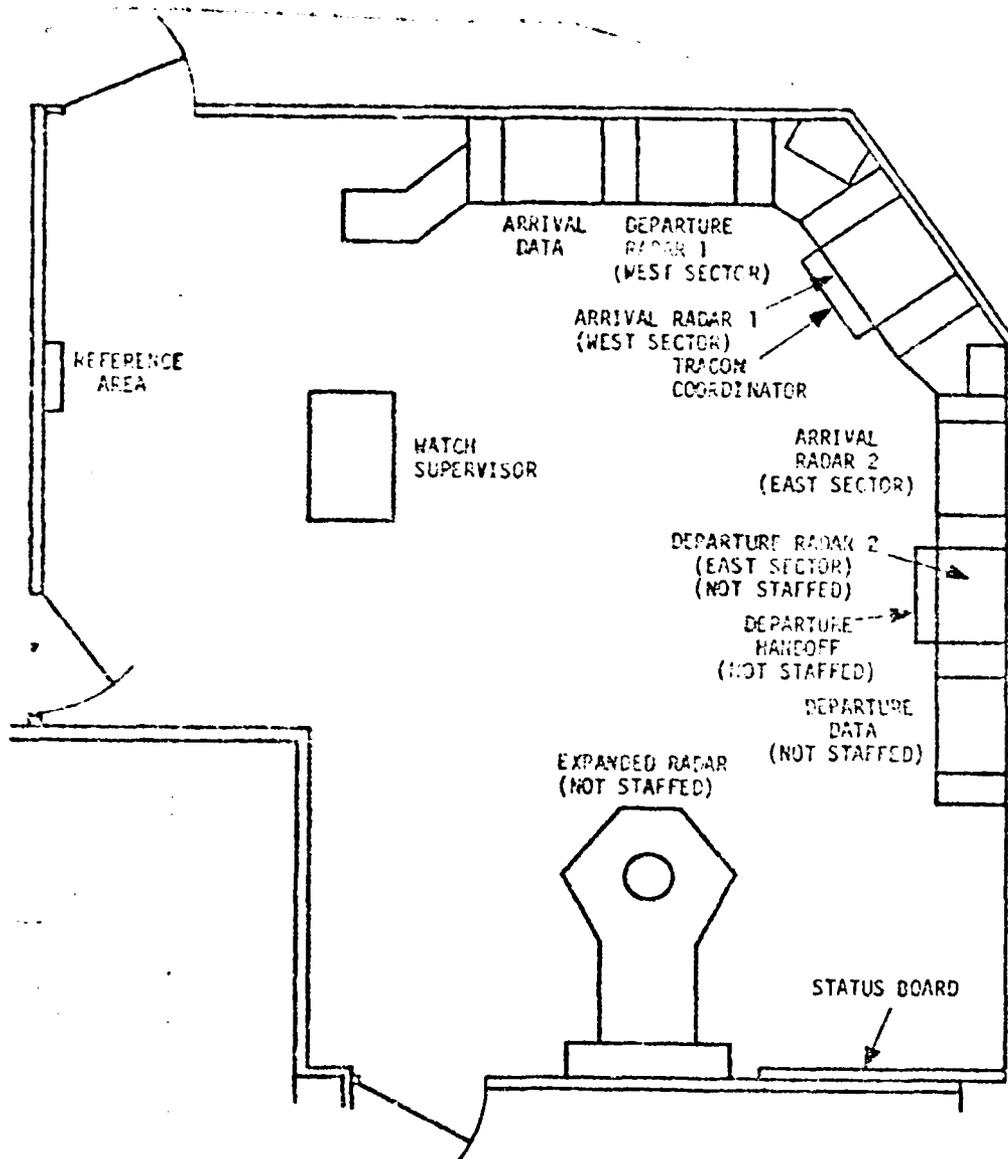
BUFFALO TRACON FLOOR PLAN SHOWING CONTROLLER POSITIONS
